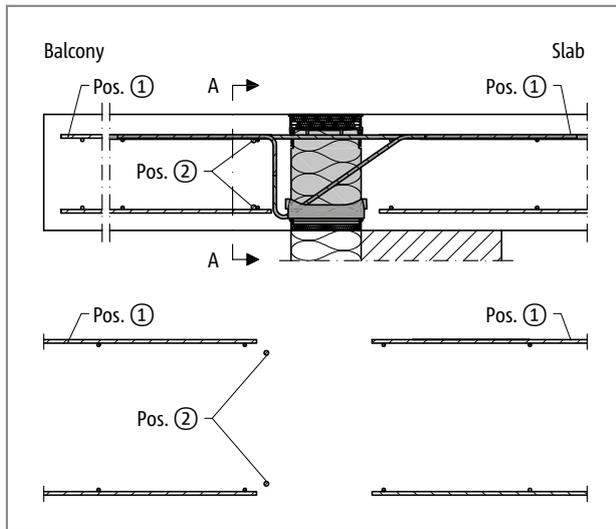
Schöck Isokorb® XT type K: on-site reinforcement with direct support
